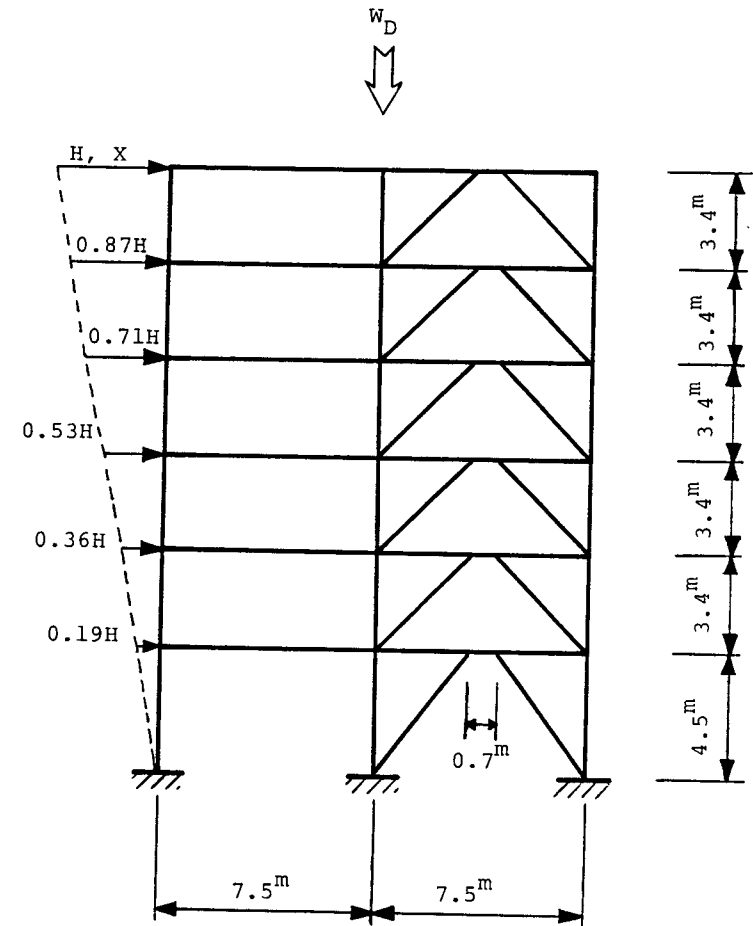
Horizontal floor forces on test structure (Goel, 1984).
